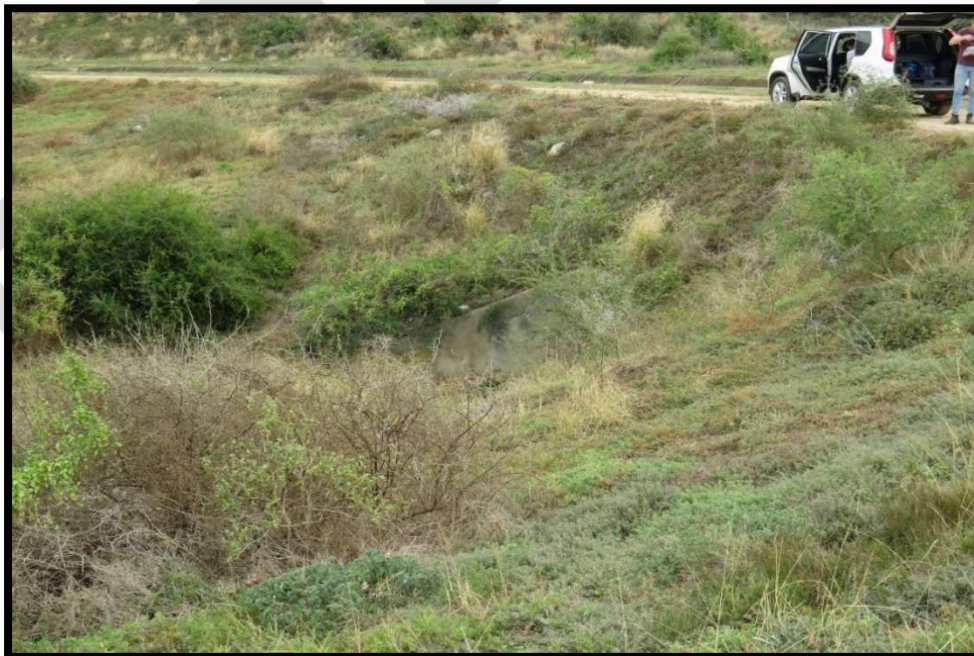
Typical culvert structure to allow stormwater under the canal (photo: T Duvenhage)
